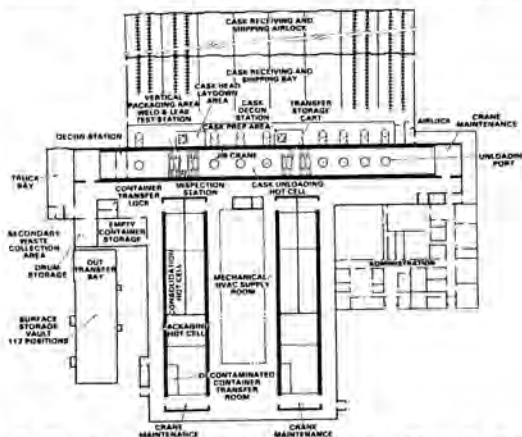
Configuration of the Waste-Handling Building in Plan View.
